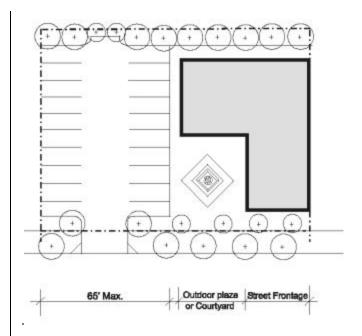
Figure Exception to 20.50.240(A)(1): Example of reduction of the building frontage in order to create an outdoor plaza.
